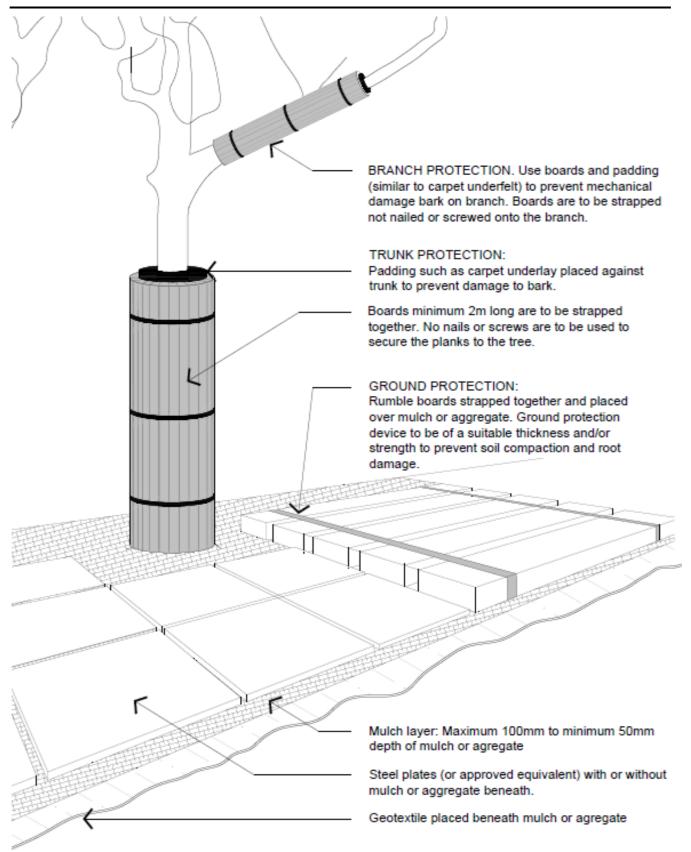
Tree Trunk and Tree protection. Source AS 4970-2009 Protection of trees on development sites. This form of protection will be required during construction.
